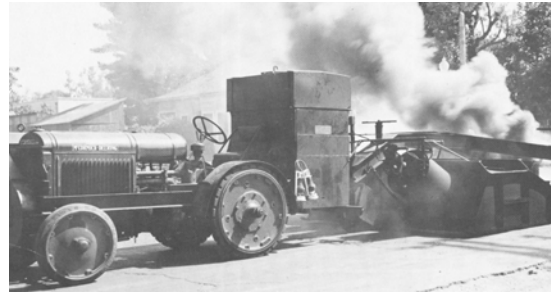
Recycling an Asphalt Pavement Which is 'Burned' in the Process of Street Resurfacing, 1936. (APWA Archives)
